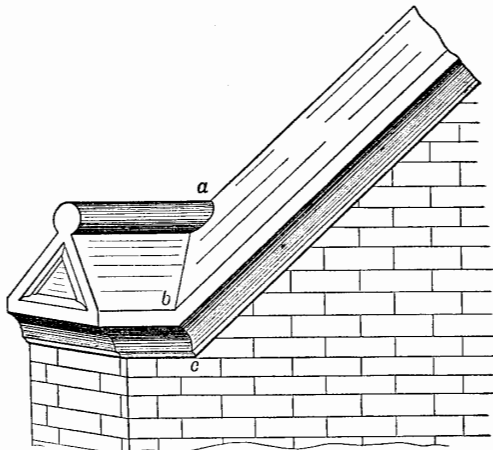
View of Molded Head Block Intersecting Pediment Coping
